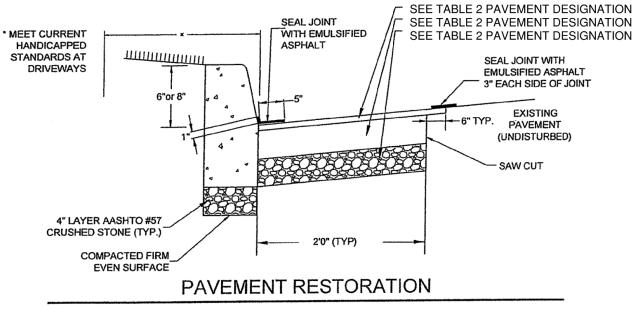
Typical Widening of Township Roads Along Proposed Developments
